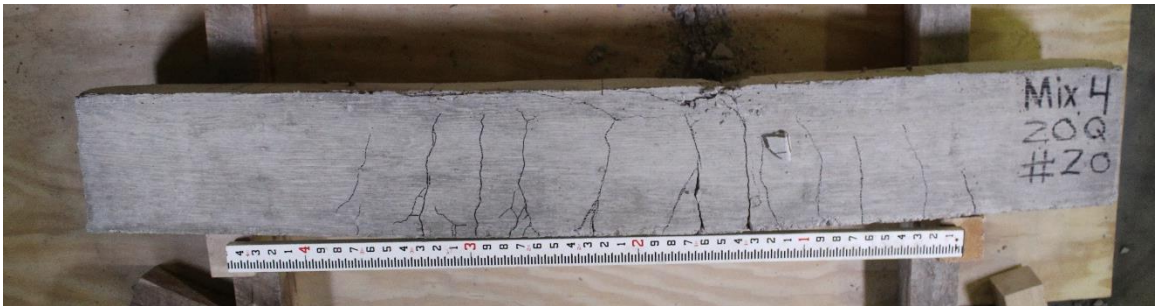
Mixture 4 (20Q) beam #20: concrete beam side view.
